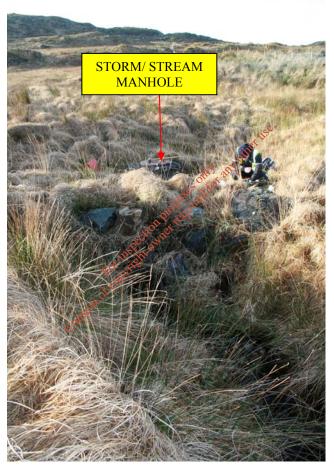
To east of site at country road facing southwards showing stream/storm access manhole and landfill to west (i.e. left)
